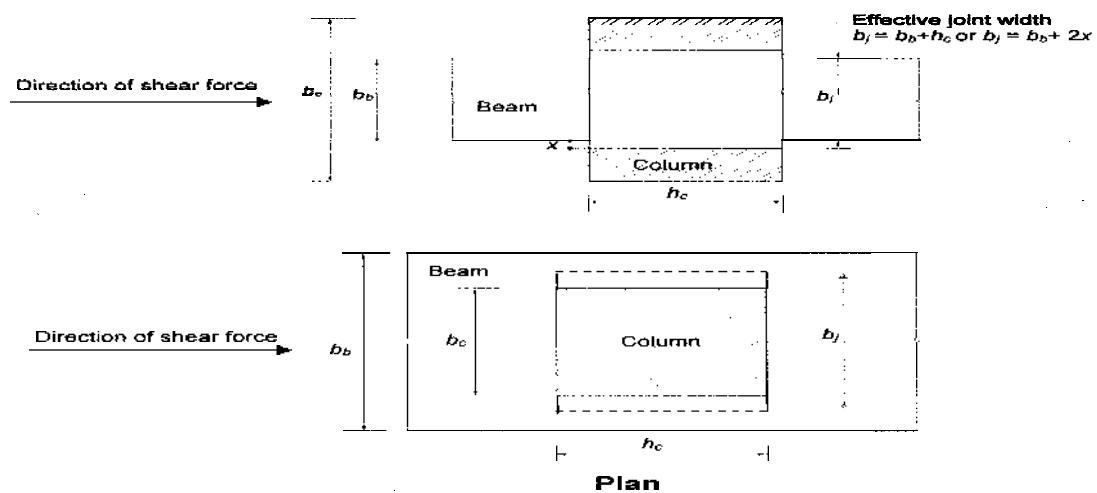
PLAN VIEW OF A BEAM COLUMN JOINT SHOWING EFFECTIVE BREADTH AND WIDTH OF JOINT
